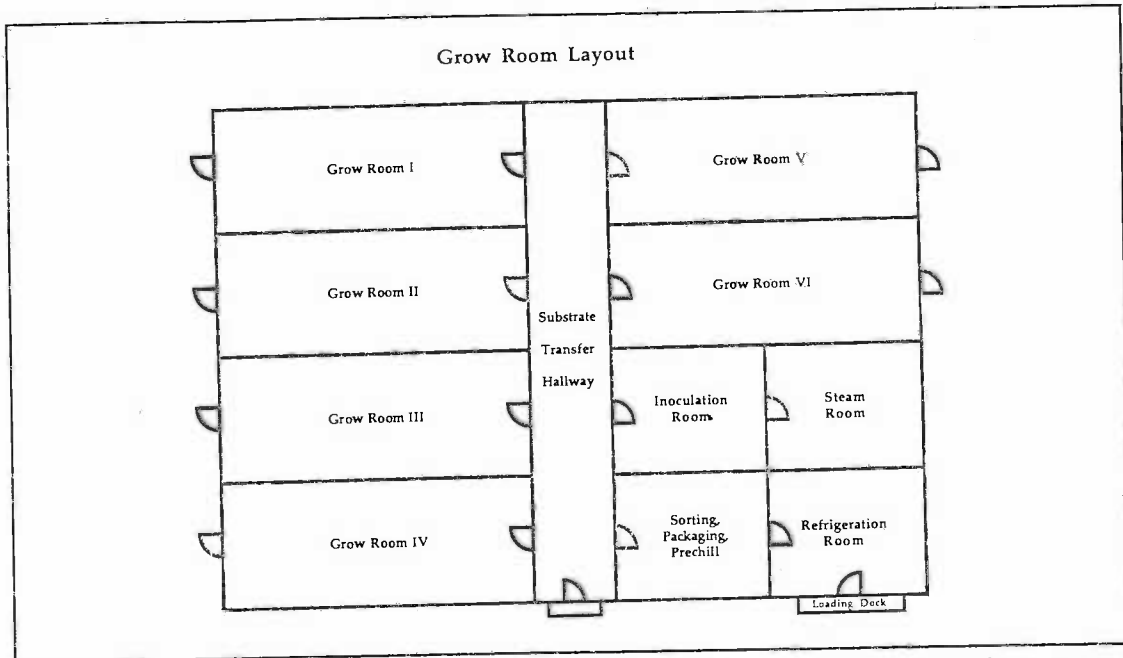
Floor plan of standard growing room complex. This configuration allows for 6 growing rooms and processing areas to be housed under one roof.
